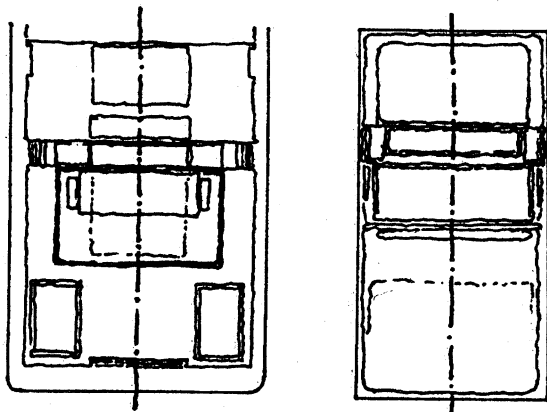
Plan of Mies's Seagram Building, 1954-58, and Rothko's No. 10, 1952
